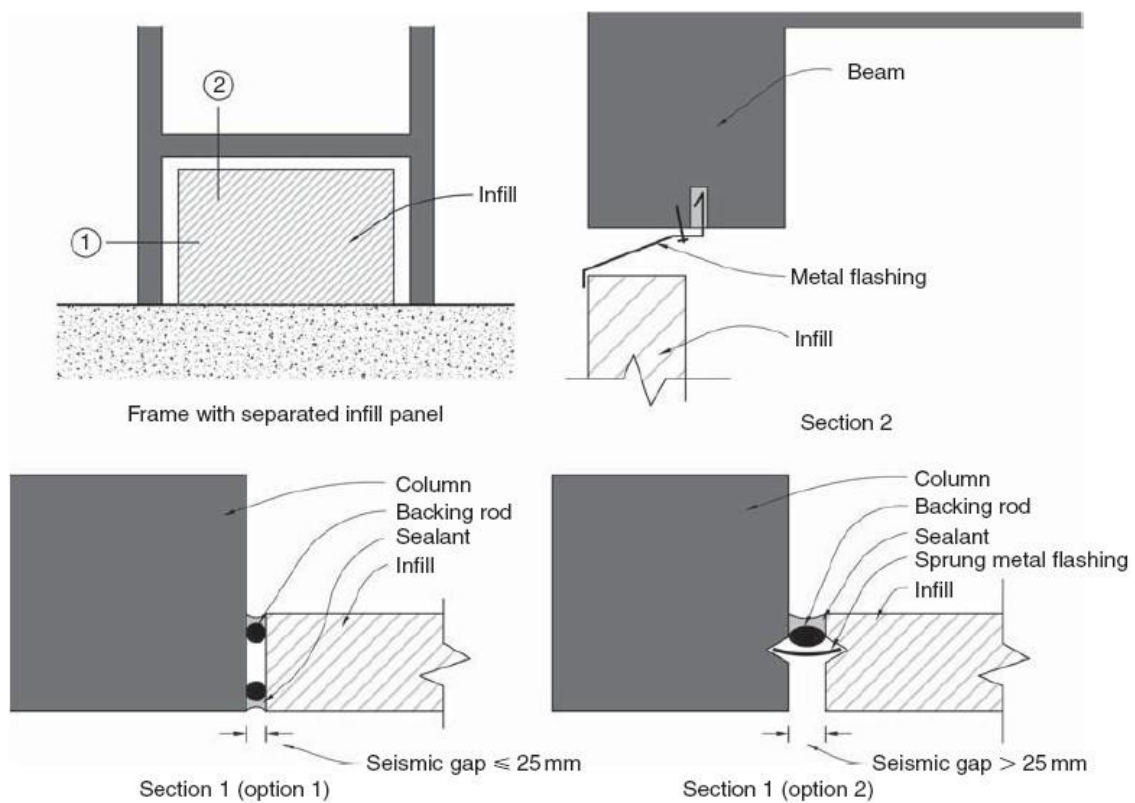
Connection details of separation gaps between infill and frame (Charleson, 2012)
